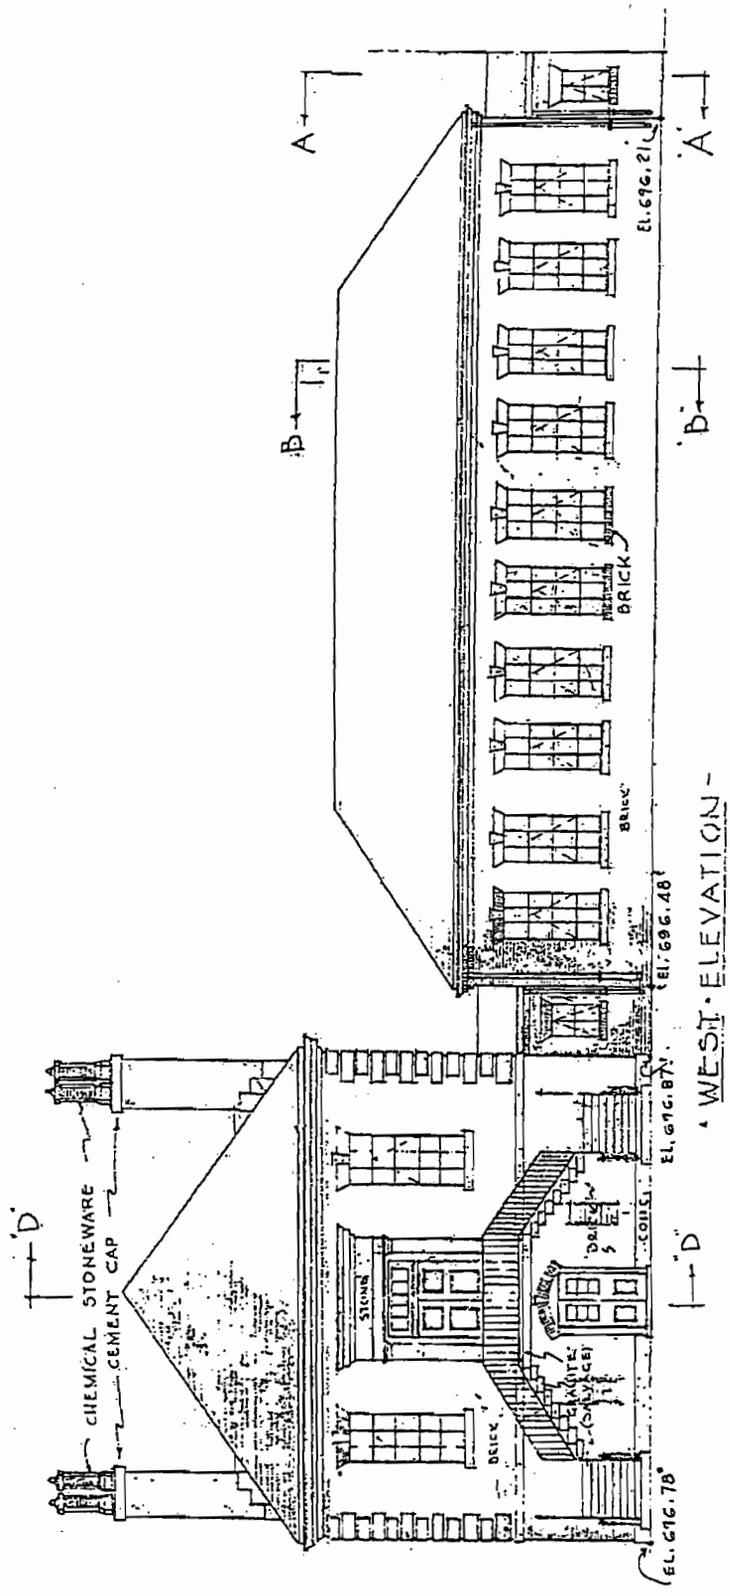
Building 162, Physics/Chemistry Lab, Blueprint # DP-27973, detail from Extension to Bldg. 162 and connecting Bldg. between 162 and 162N, Elevations and Sections, April 4, 1940, War Plans Division, Ordnance Department. Picatinny Arsenal, Morris County, New Jersey (on file in DPW, Picatinny Arsenal).
